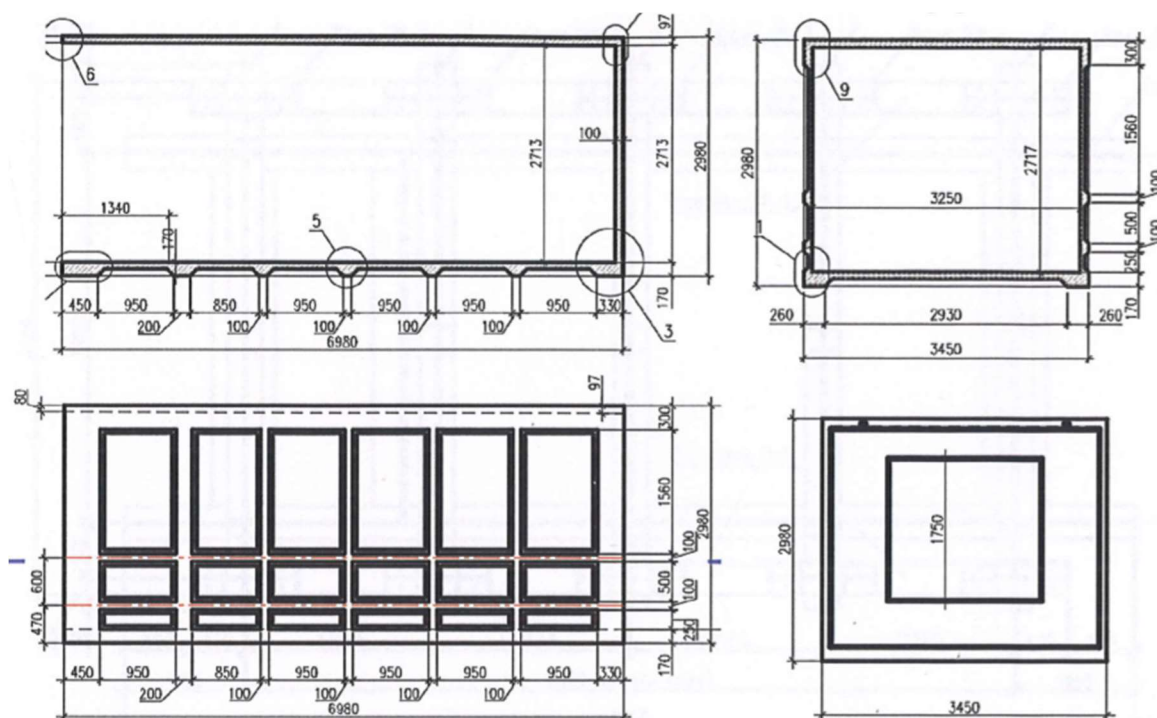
Formwork drawing of the volumetric module and wall panel.
